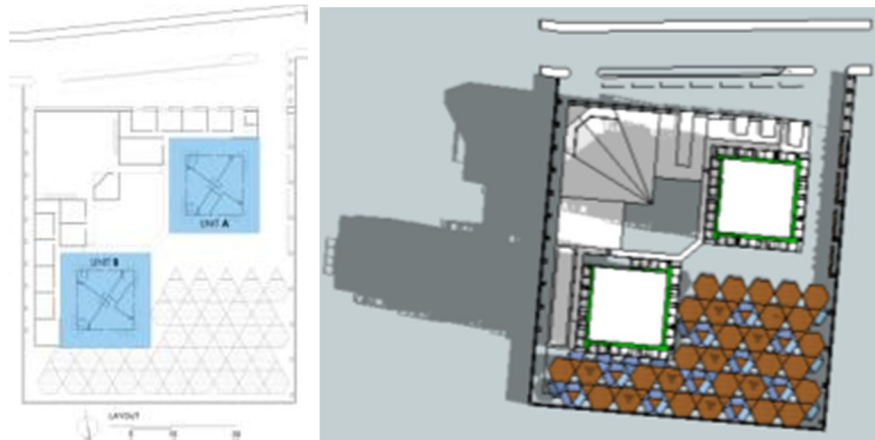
Ground floor (right) Shadowing (Source: Author, 2016)
